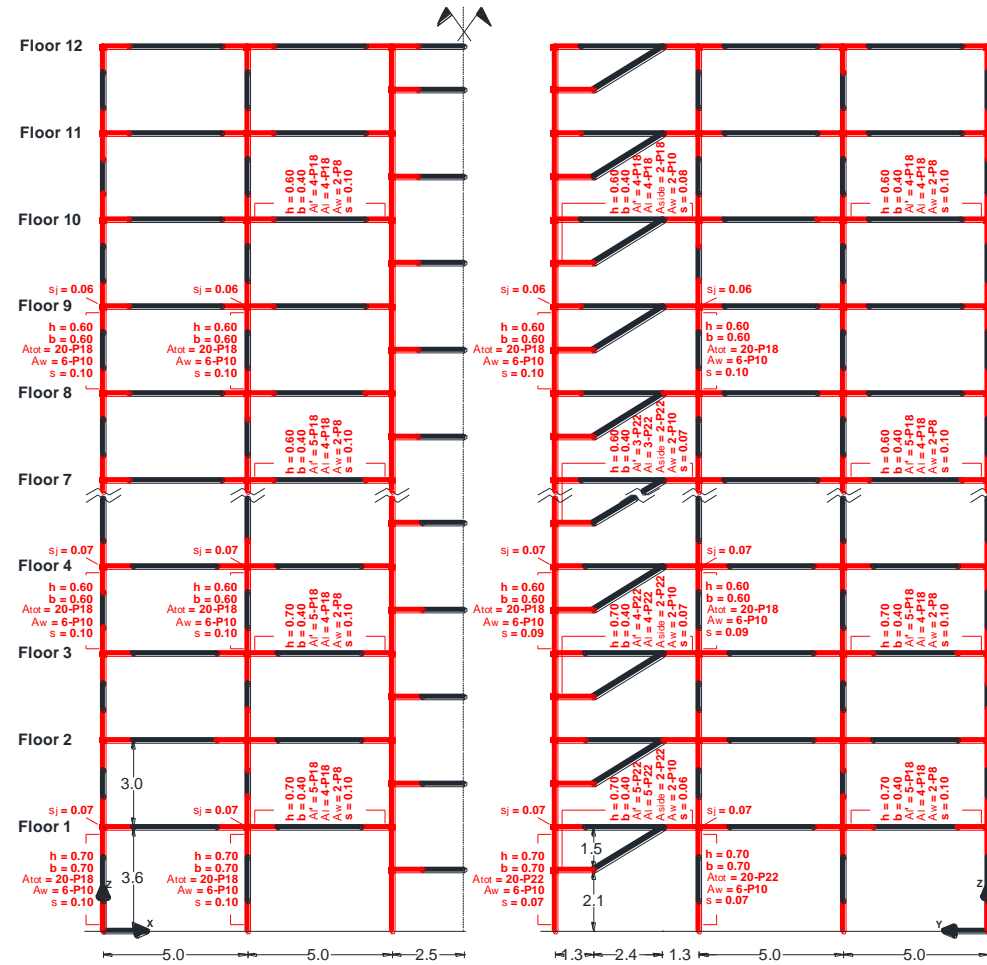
Geometrical and reinforcement details for the benchmark building designed for DCH. Legend: h = section depth, b = section width, A_l = bottom longitudinal bars, A_l' = top longitudinal bars, A_{tot} = total longitudinal bars, A_{side} = total lateral longitudinal bars, A_w = stirrup bars, s = stirrups spacing in critical regions, and s_j = stirrups spacing in joints.
